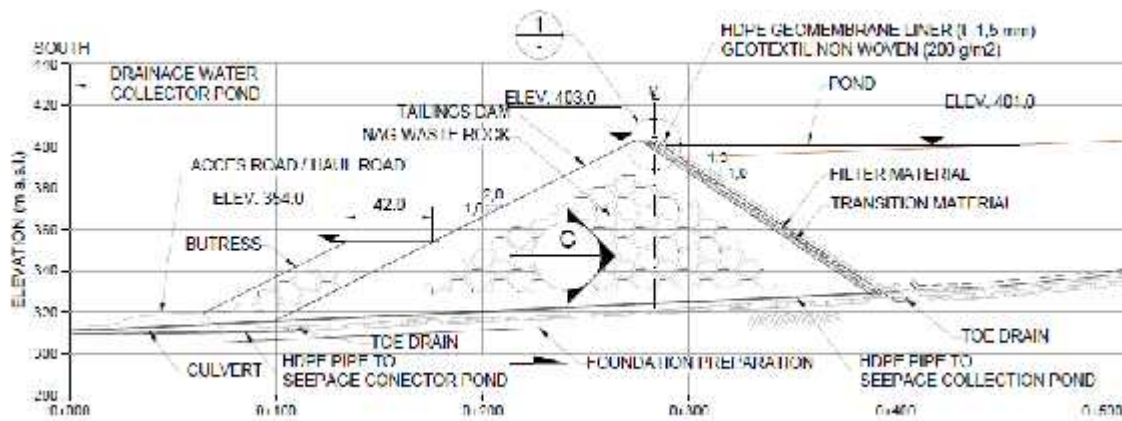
Tailings Dam Cross Section (Golder 2017)
